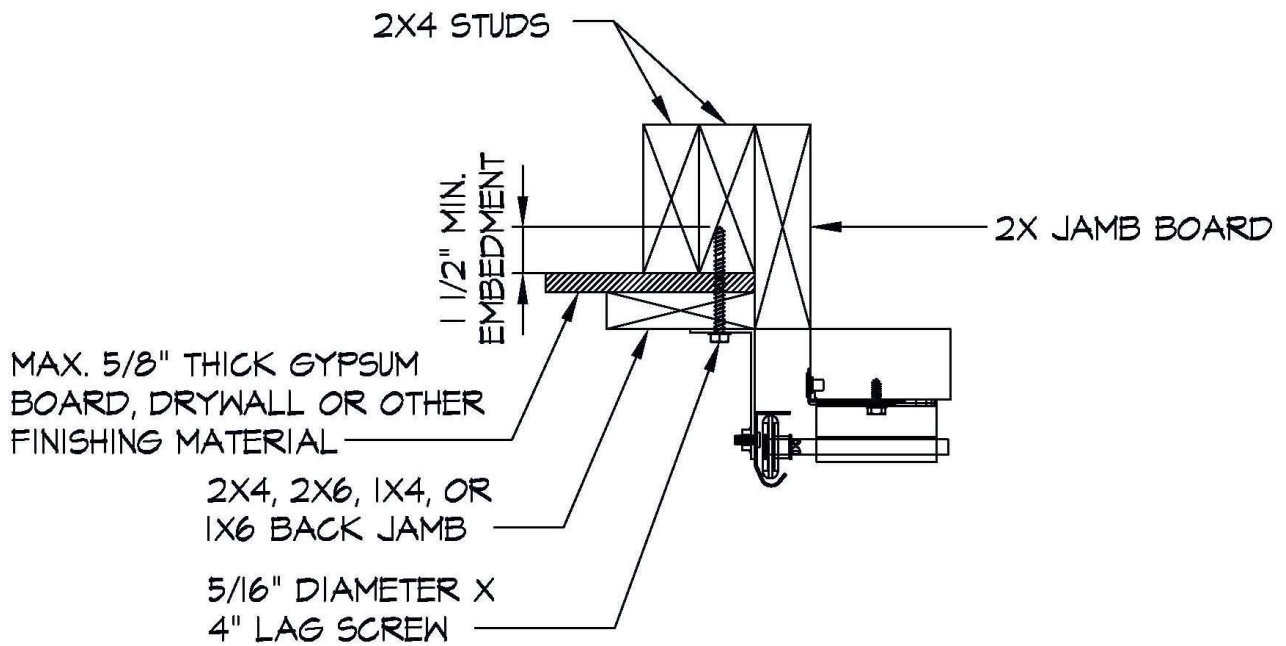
Attachment of garage door brackets directly to structure through wood jamb with finishing material behind jamb (Option 4)
